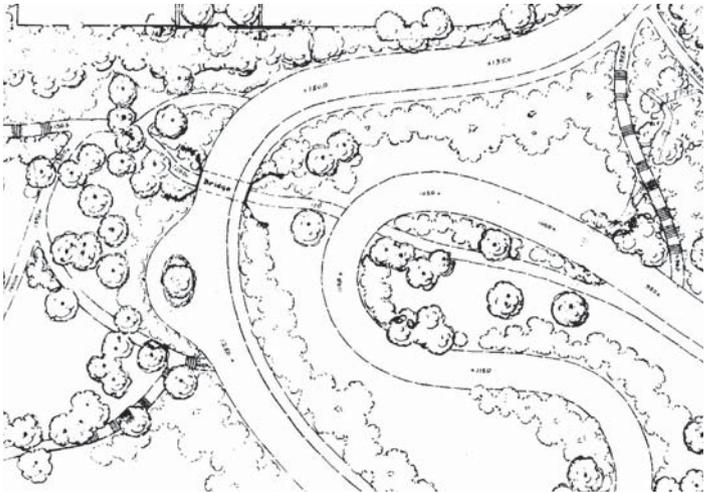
1910 ZOOM INTO PRELIMINARY PLAN FOR COLMAN PARK OLMSTED BROTHERS PLAN @ 1"=80'.
